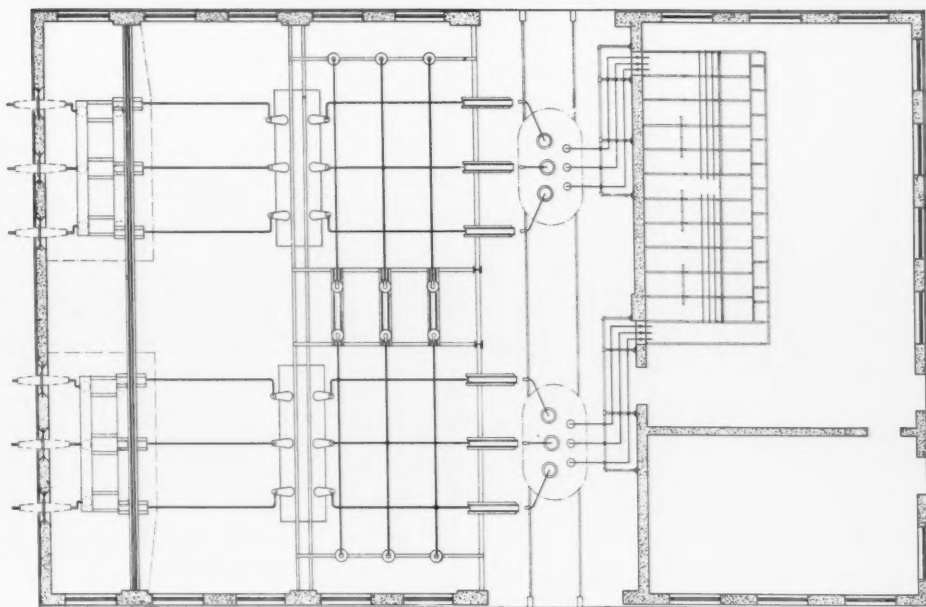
Floor plan of transformer house showing position of electrical equipment
